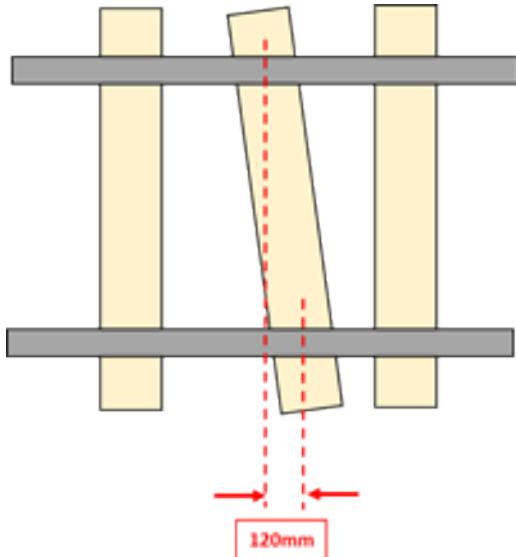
Skewed Sleeper Adjacent to a Weld
